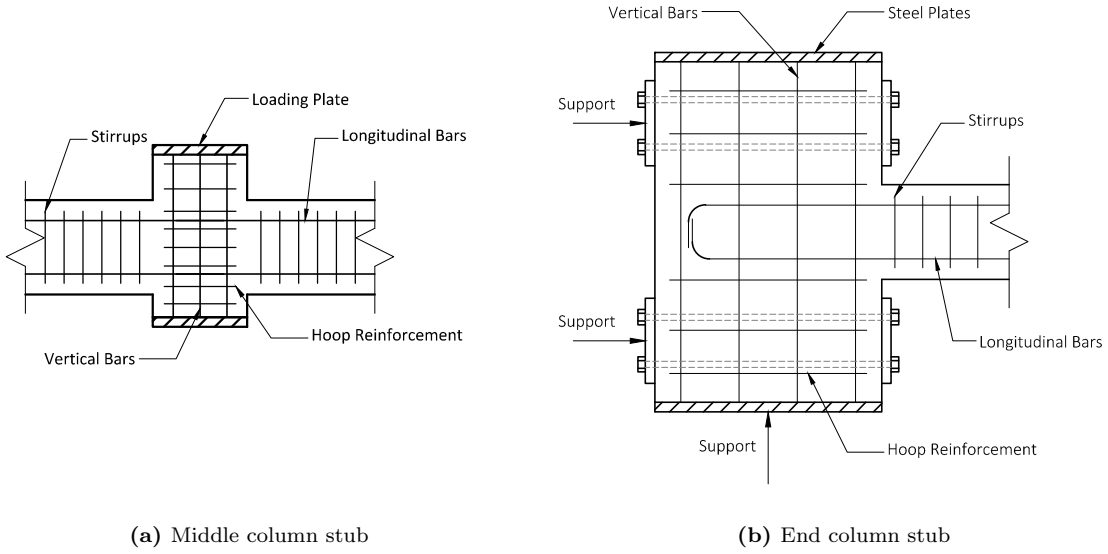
Reinforcement layout in the column stubs, adapted from Yu (2013).
